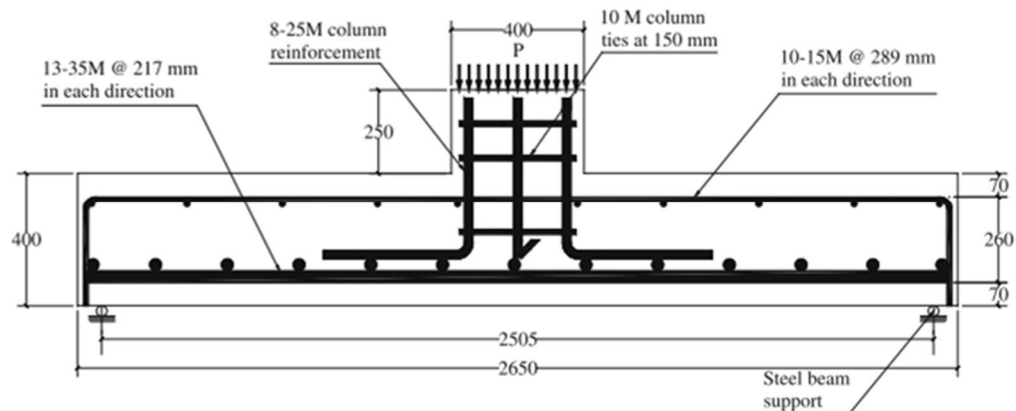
Details of typical test specimen HS6. [20, p. 1506]
